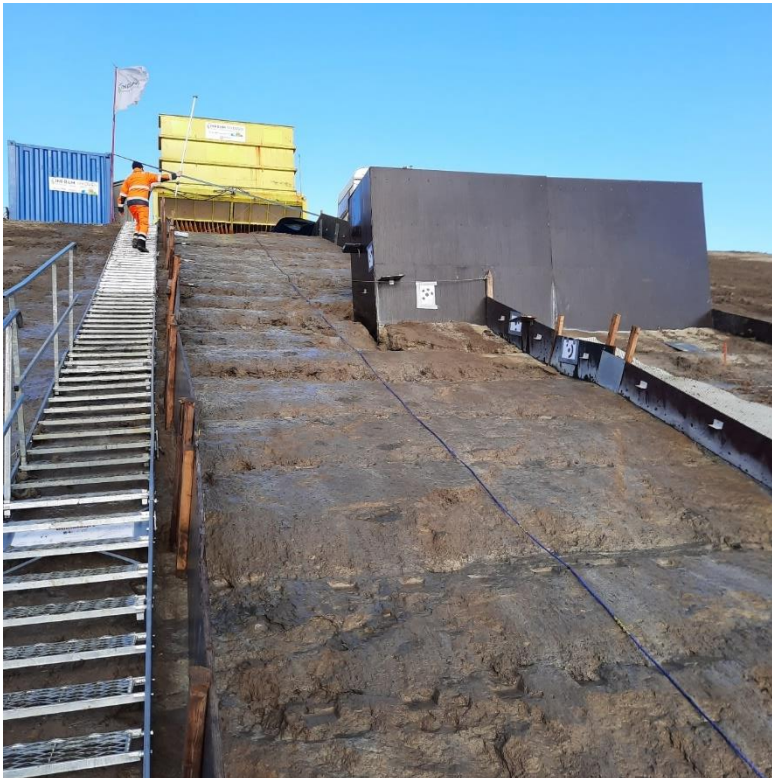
Situation in Section 1A after the test with 190 l/s/m'.
